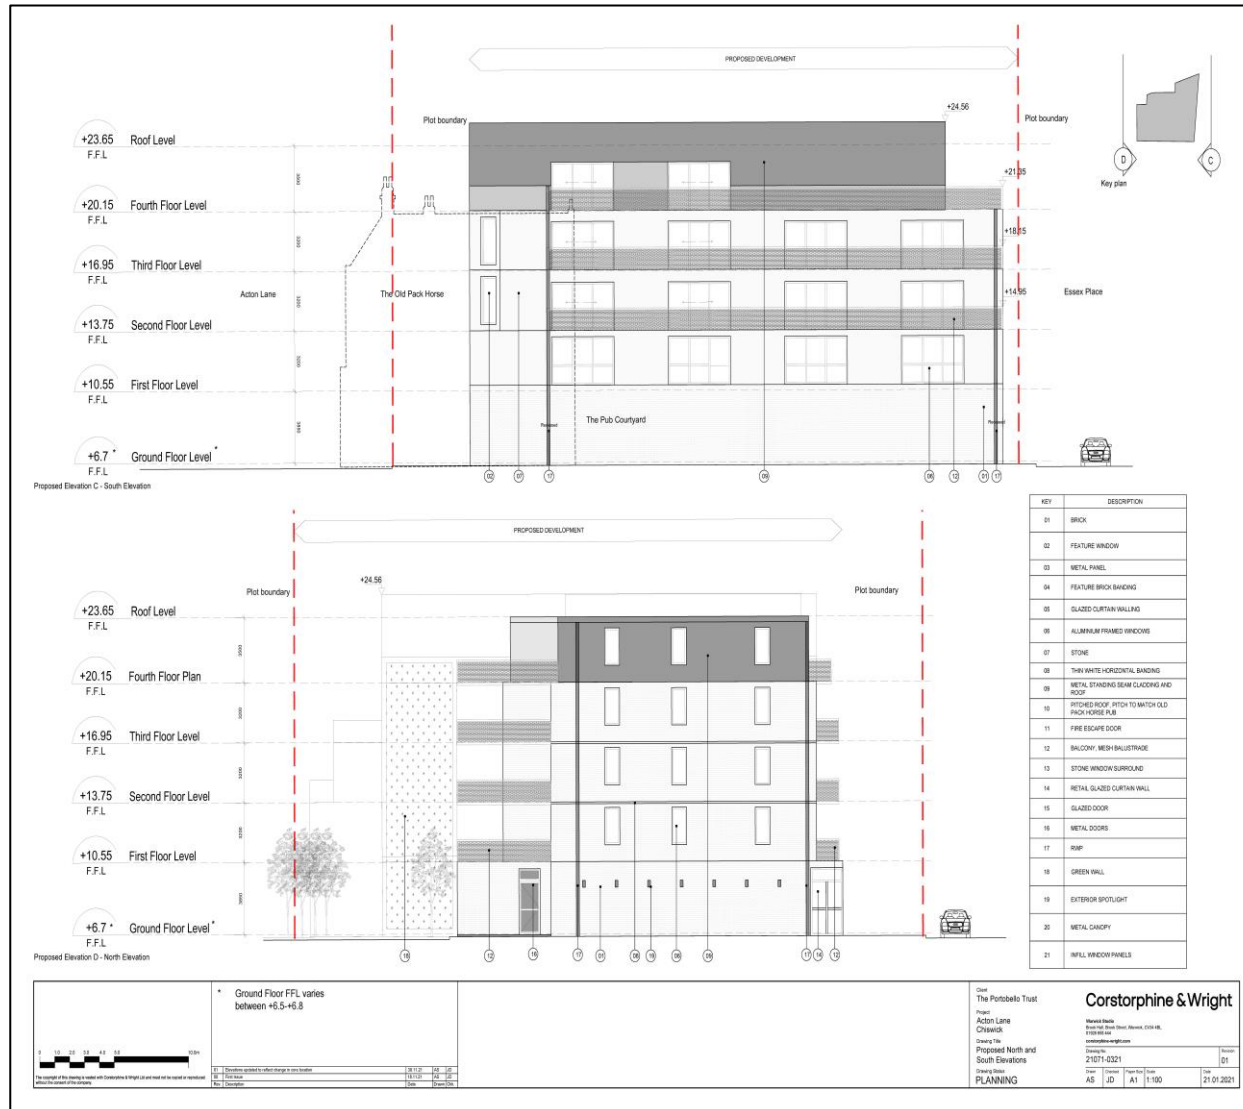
Proposed Elevations C and D - South and North Elevations (Reproduced courtesy of the Client)
